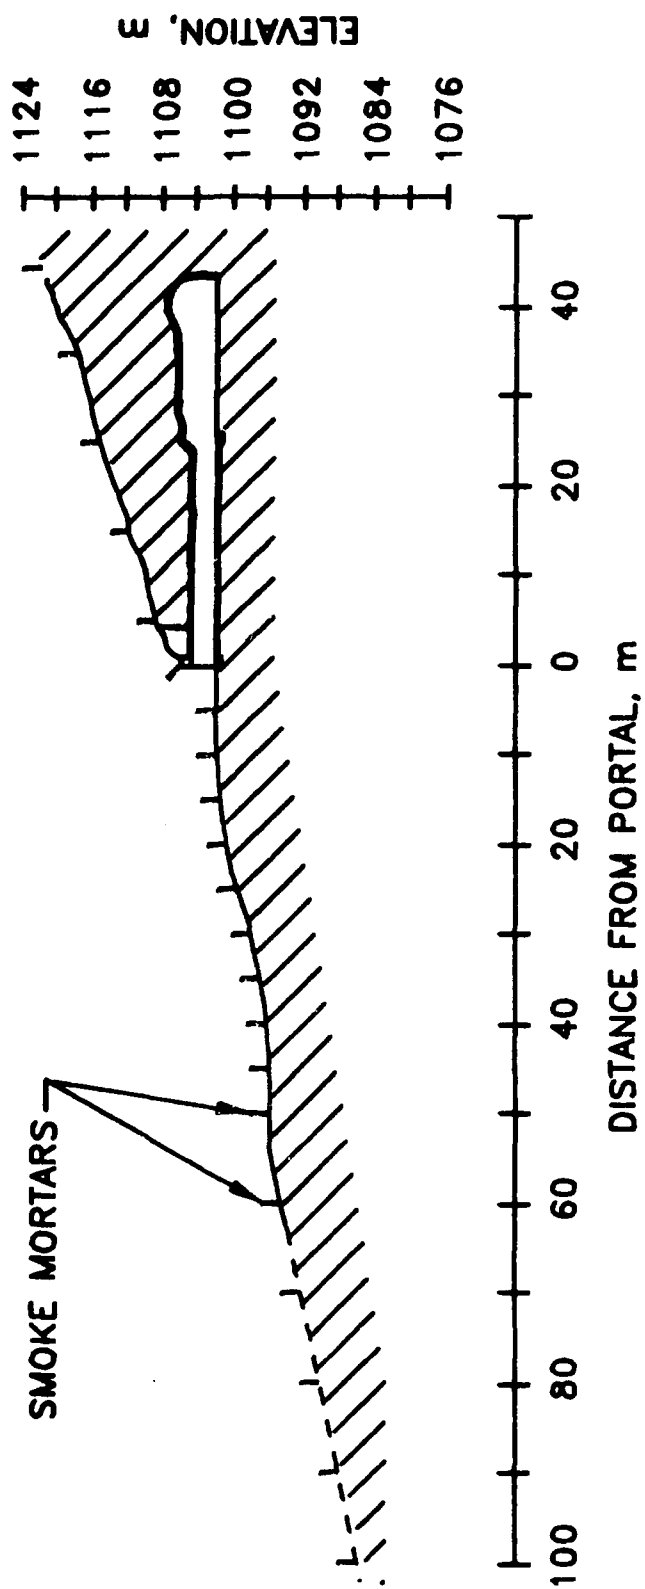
Smoke mortar locations for Shallow Underground Tunnel/Chamber Test.
